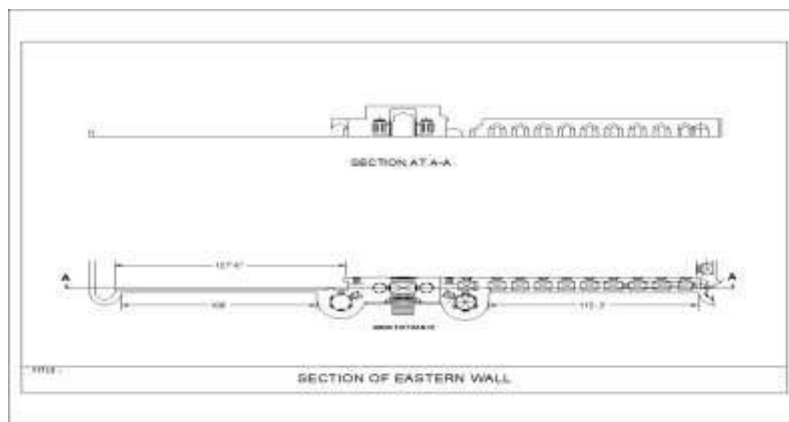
Plan of Section of Easter Wall (Section A-A) of Rewat Fort (after Saeed 2020, p.50)
